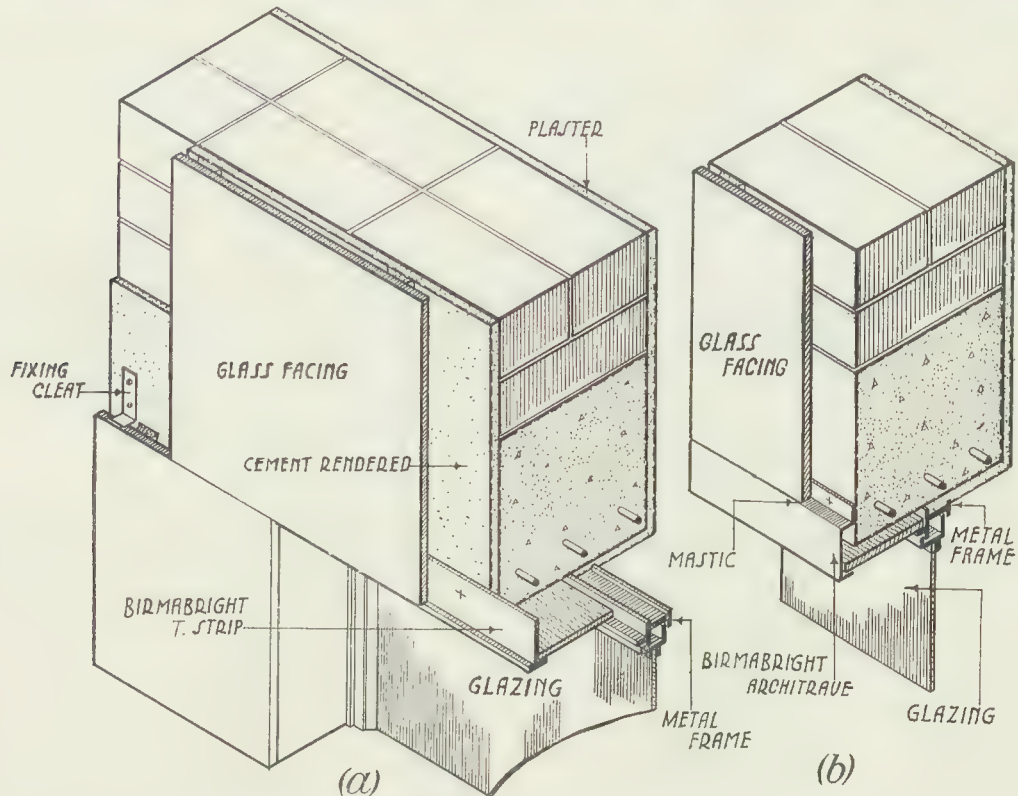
DETAILS SHOWING THE CONSTRUCTION OVER OPENINGS IN GLASS-FACED WALLS
